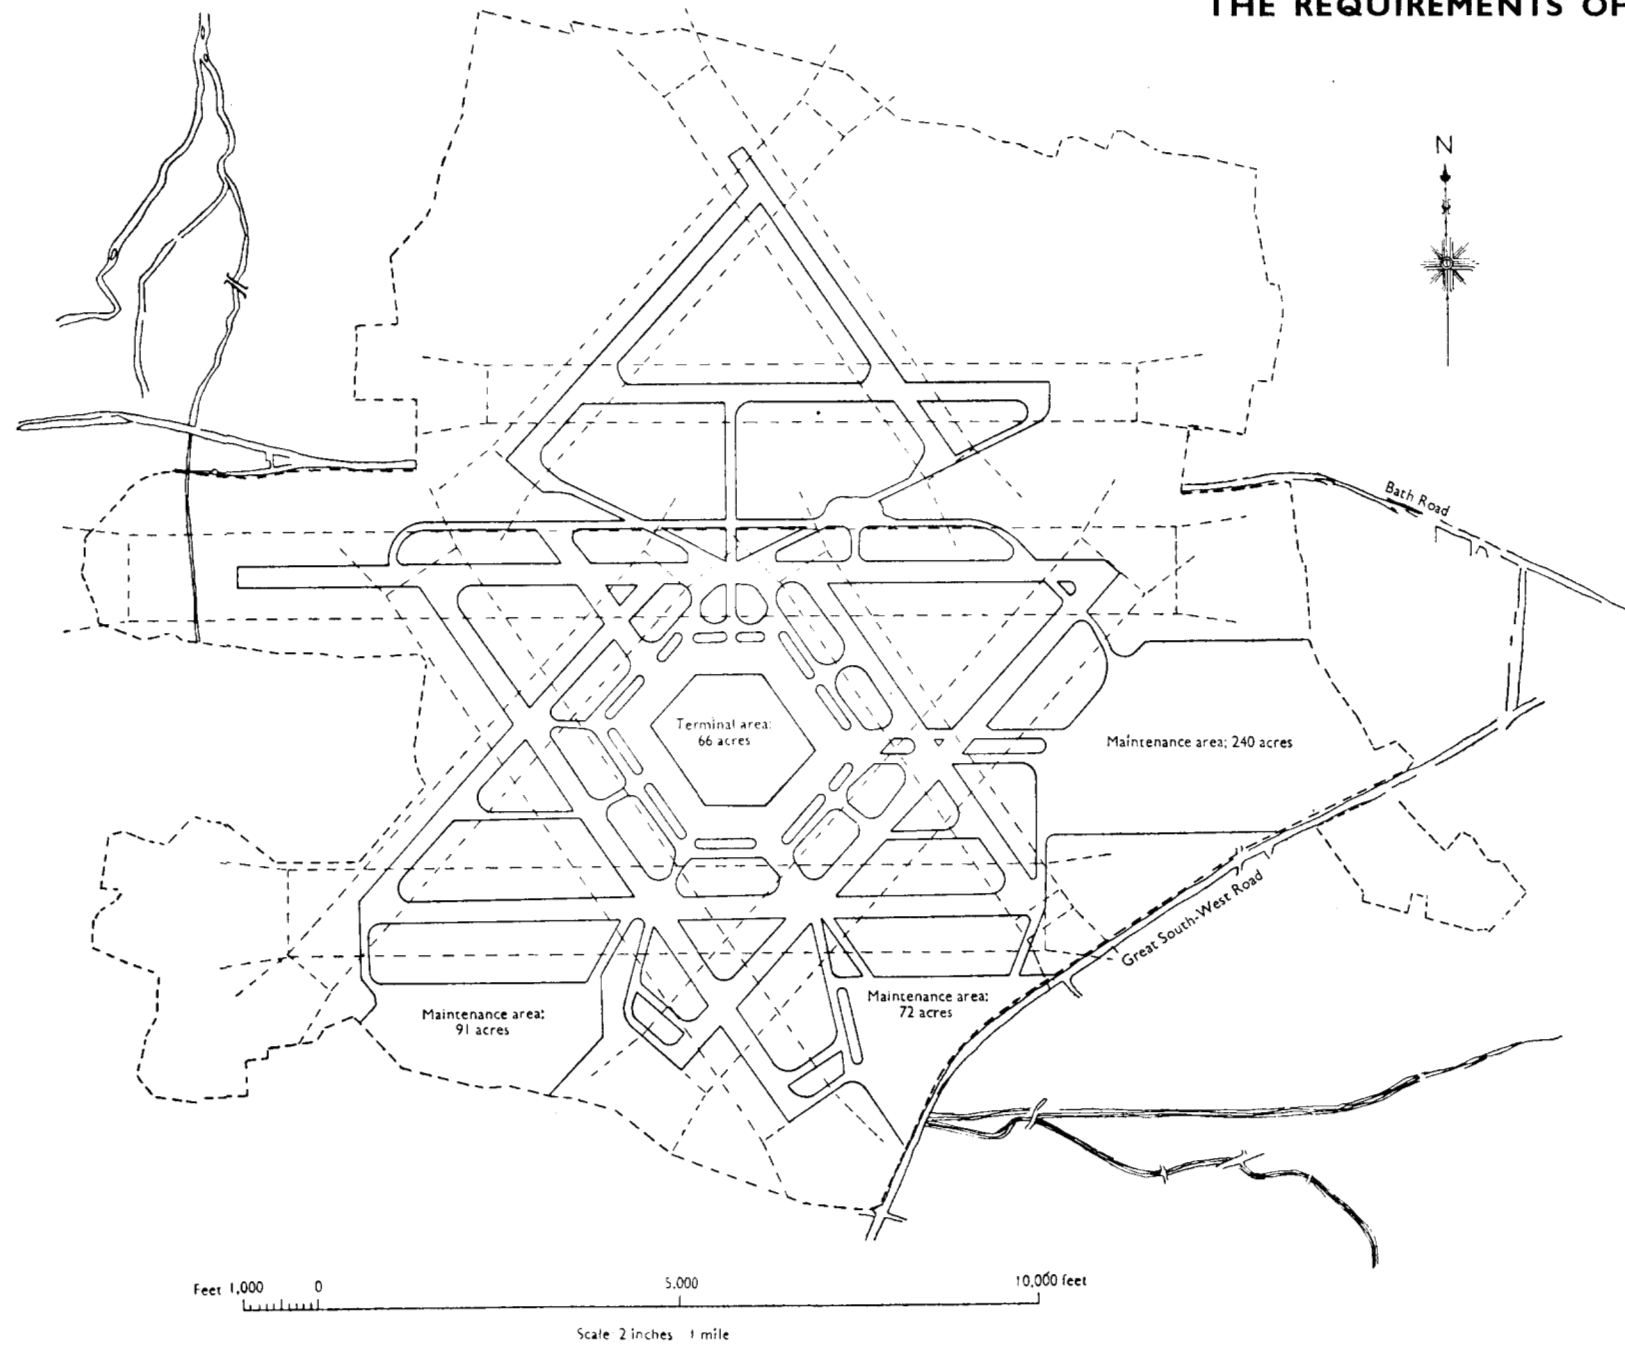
LONDON AIRPORT. FINAL LAYOUT RECOMMENDED BY LAYOUT PANEL, 1946
